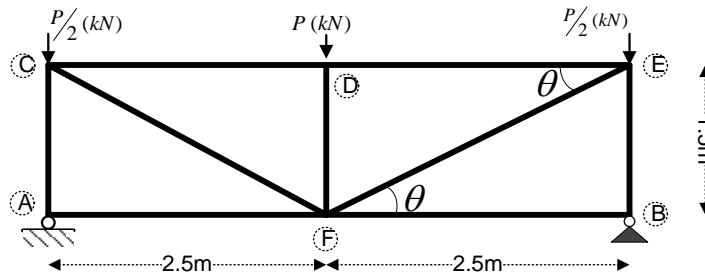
b: Truss structure supporting main beams that support the dais deck
